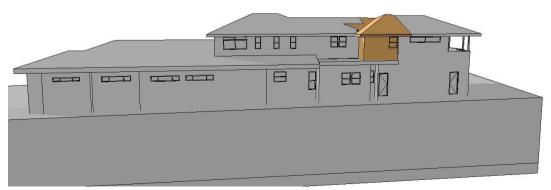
Proposed modification shown in orange (Action Plans 2018)
